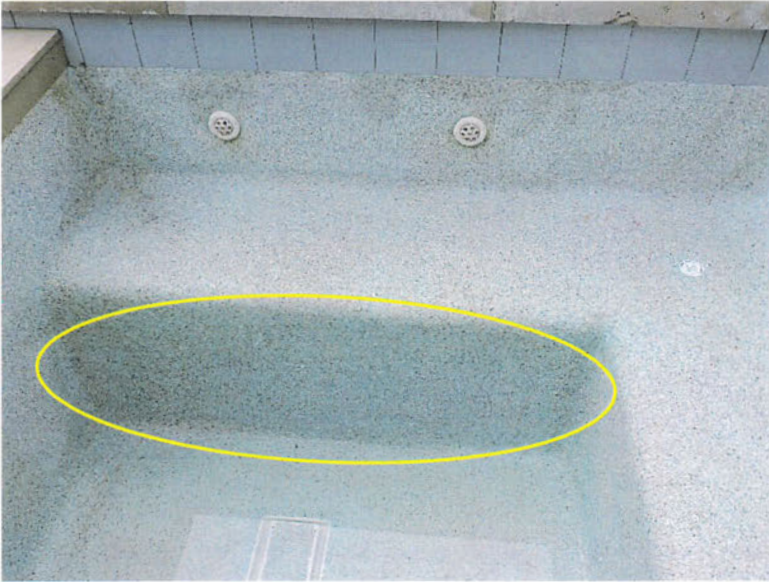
Cracking distress and efflorescence along bench of spa
